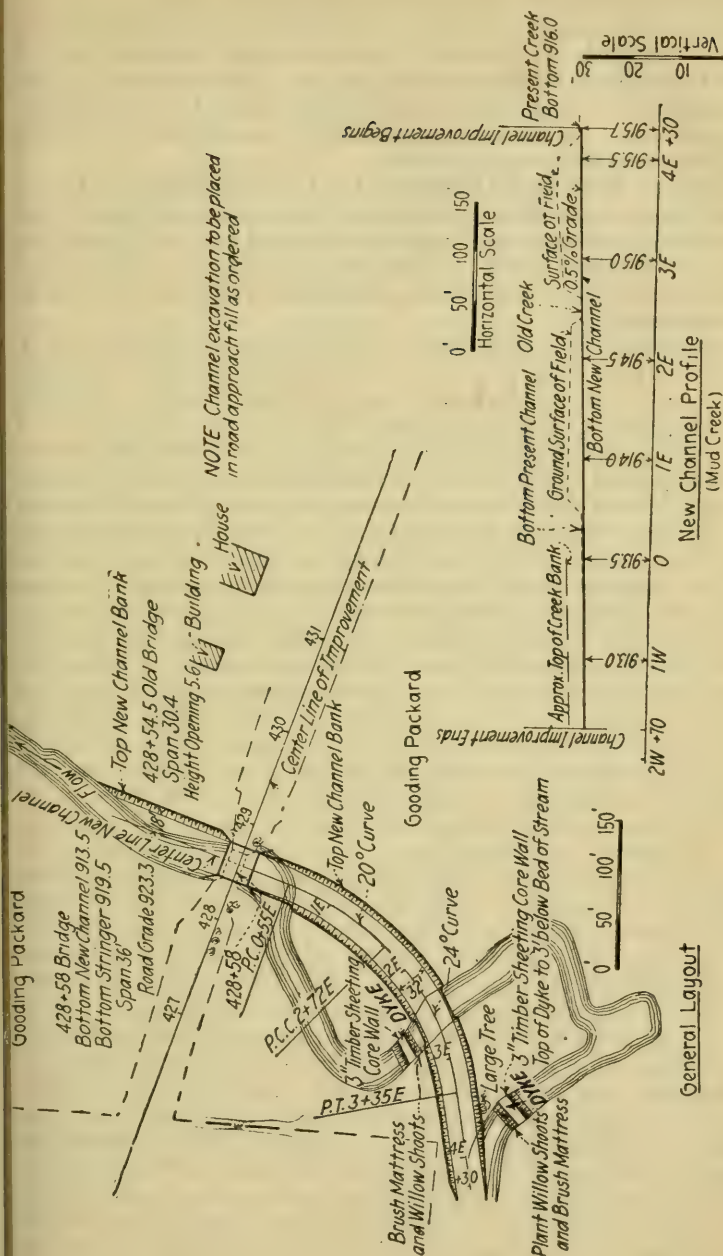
Channel improvement reducing required span and minimizing scour and silting at bridge site.
